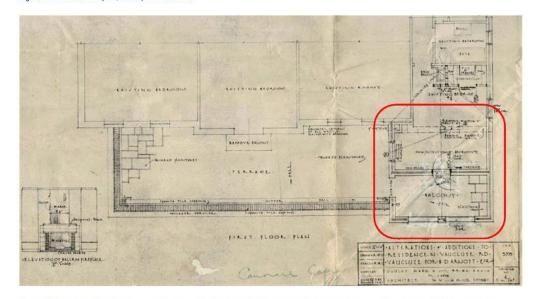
First floor plan showing extension to existing bedroom 4, including new balcony, and construction of a new first floor level terrace with Spanish tile capping
